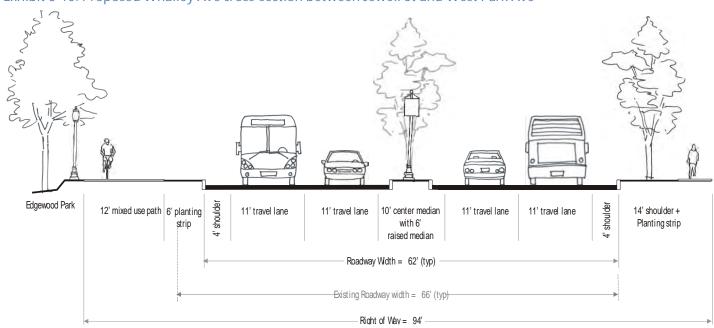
Proposed Whalley Ave cross-section between Jewell St and West Park Ave
